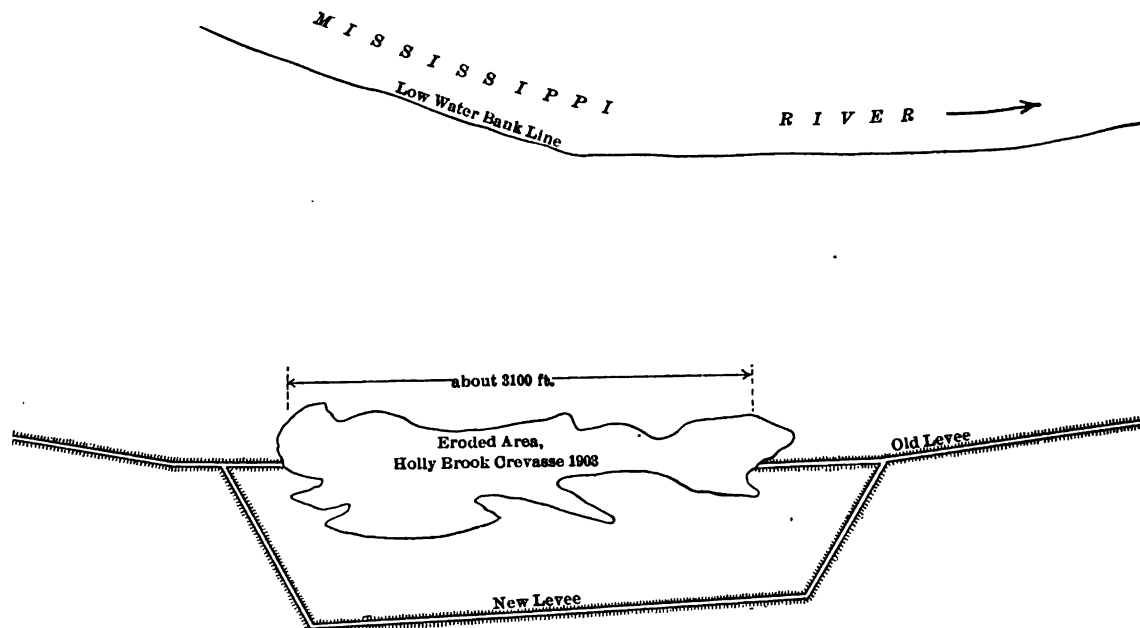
Erosion and New Levees, Holly Brook Crevasse.
